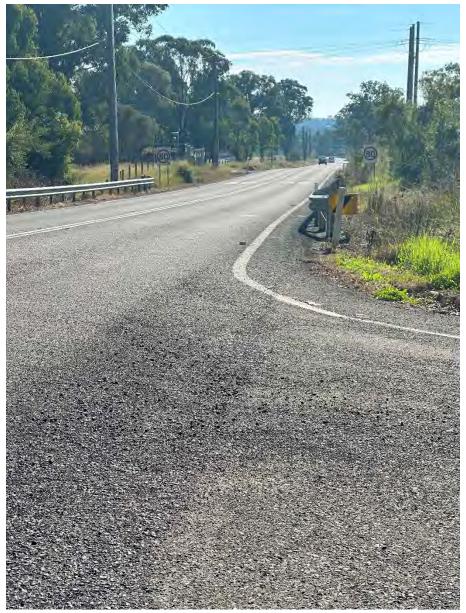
Existing Exiting Traffic View Distance – Browns Road Looking North
